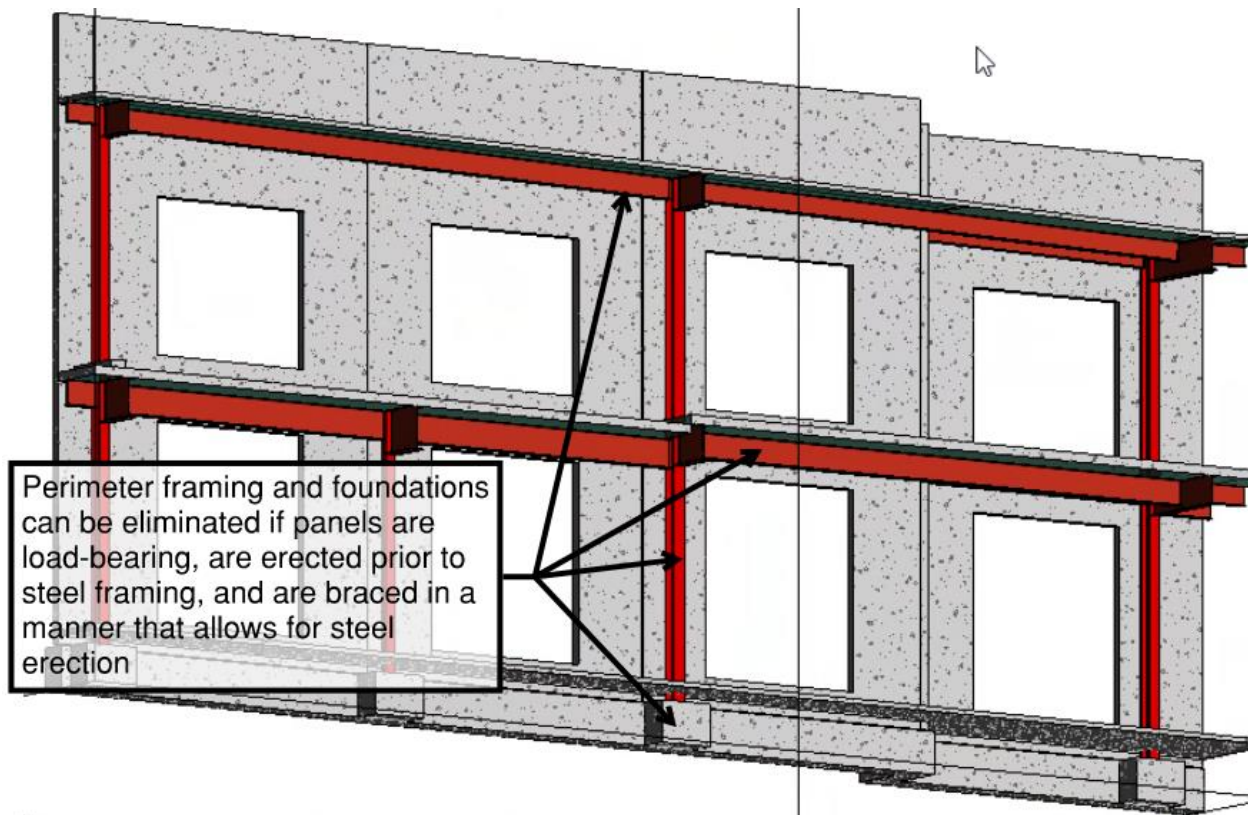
, Verify if wall panels will be load bearing, or if perimeter framing will be required
